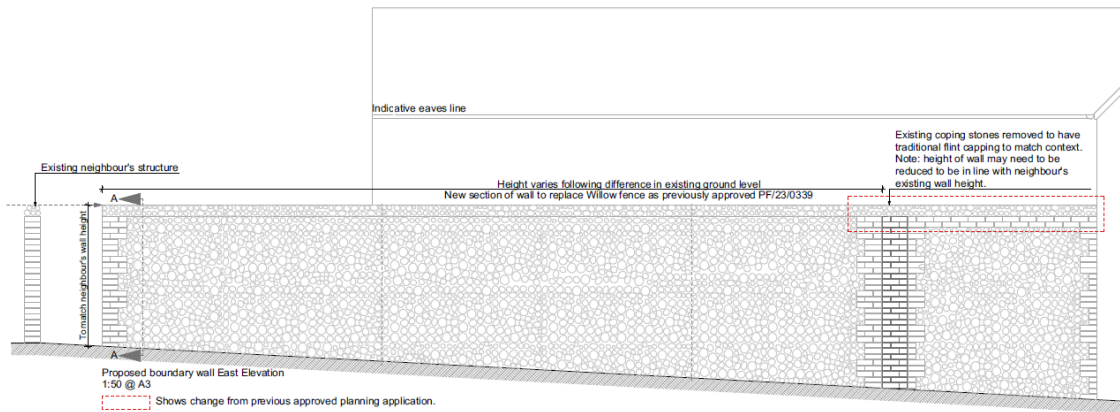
elevation showing proposed change to coping detail over existing brick and flint wall.
